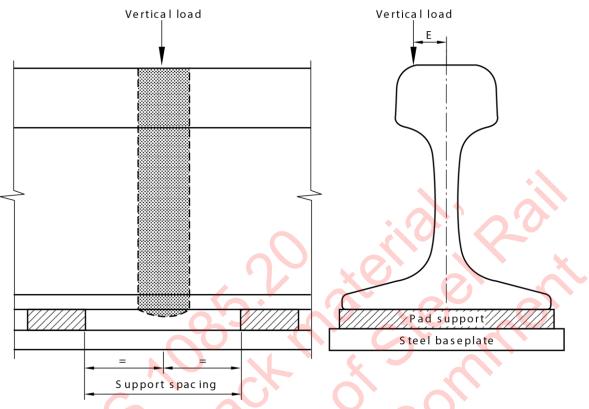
Typical assembly for the fatigue testing of web of welded rail
